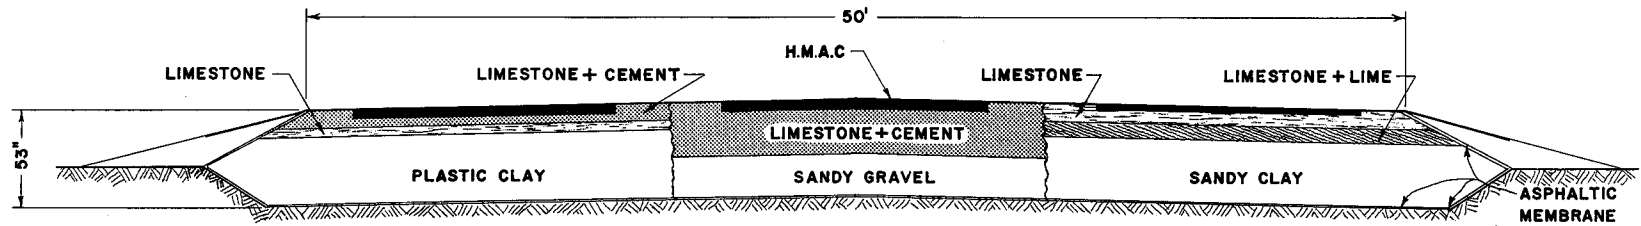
Cross-section of pavement test facility (Section A-A of Figure 1)
